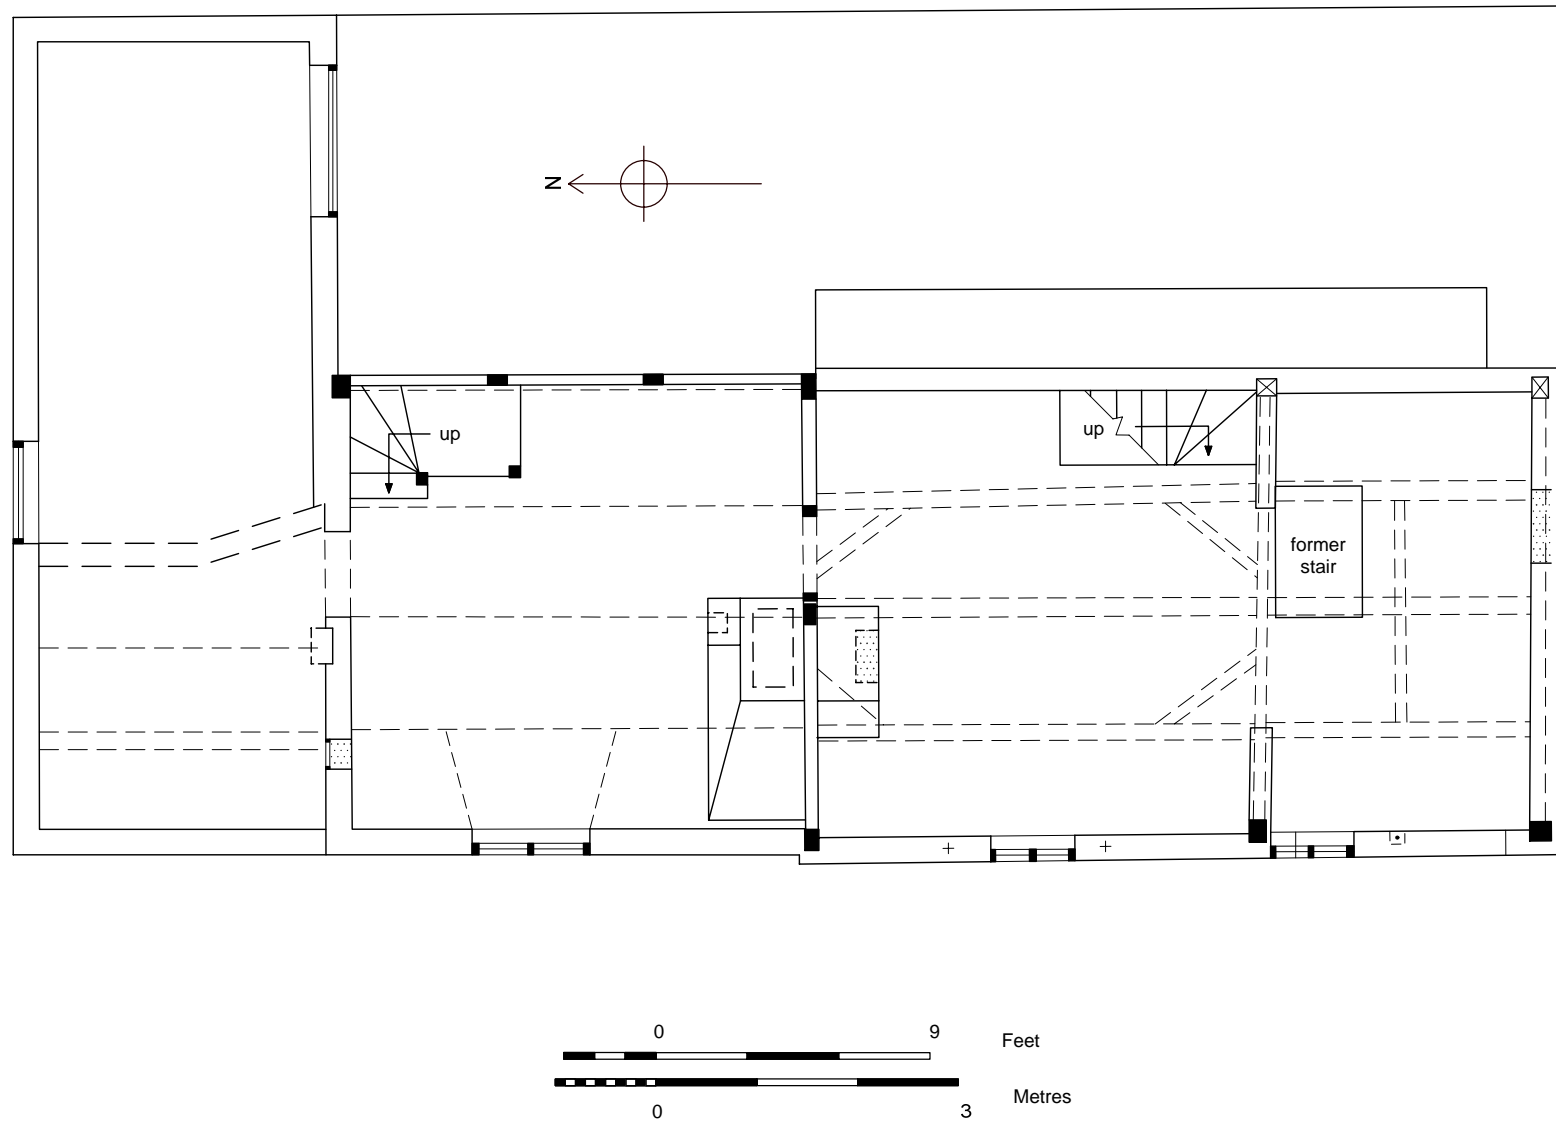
The Old Cottage, Main Street, Cotesbach. First Floor Plan.
